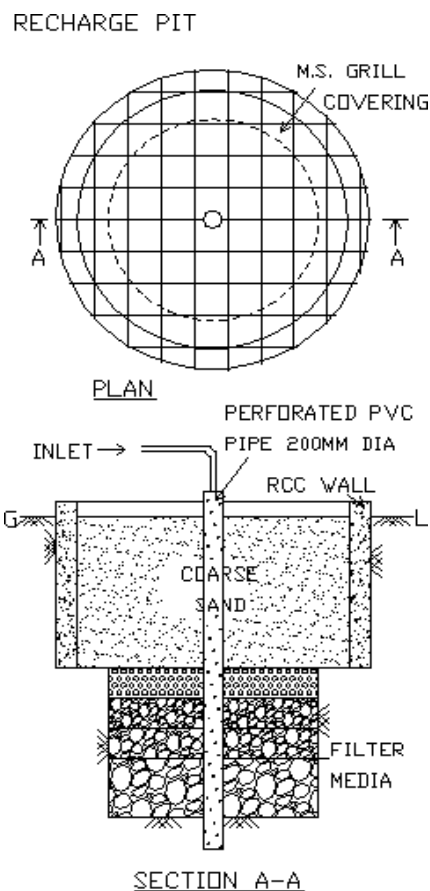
Plan and Cross section of Water Harvesting Tanks
